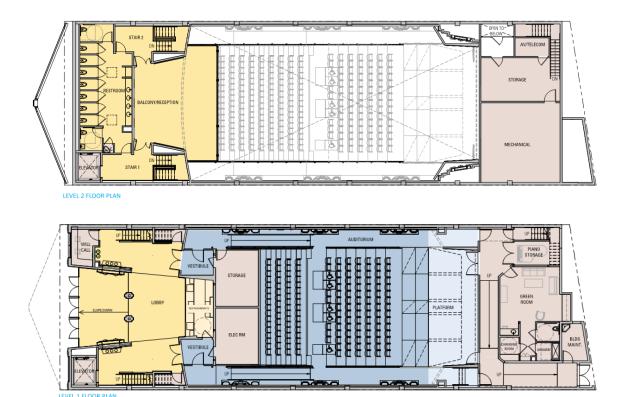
Proposed first and second floor plans for the Nimoy Theater. Source: BAR Architects, October 31, 2019, edited by Page & Turnbull.
